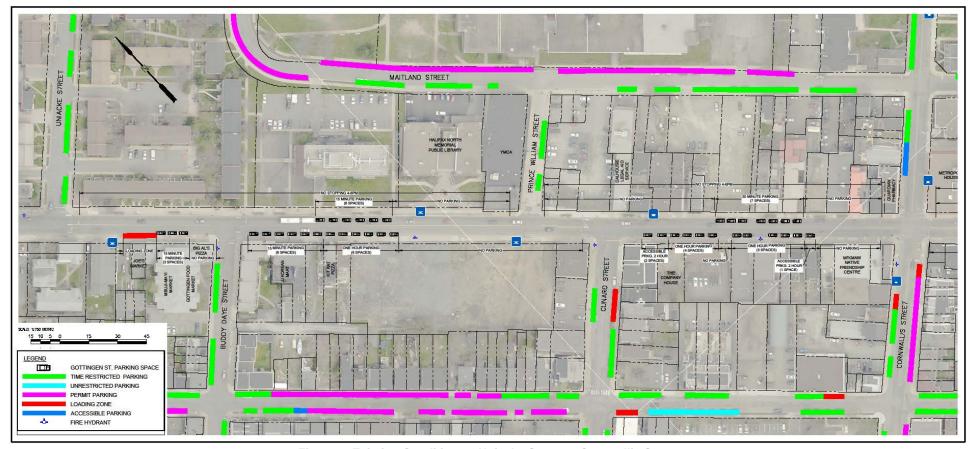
Existing Conditions – Uniacke Street to Cornwallis Street
